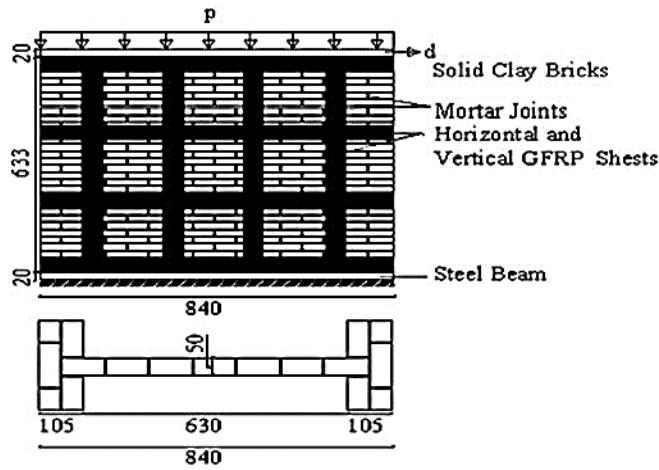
Geometrical details of HRM C2 wall [13, 26].
